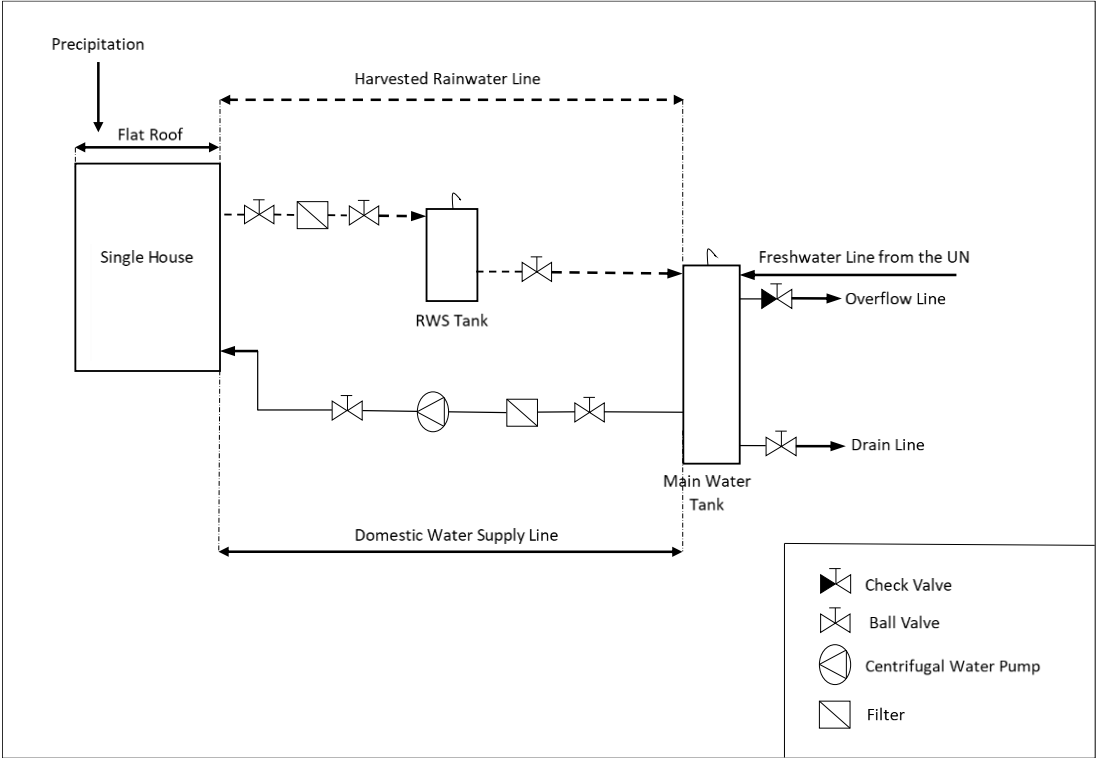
Schematic Plan View of the Designed Rooftop RWHS for a Single House
